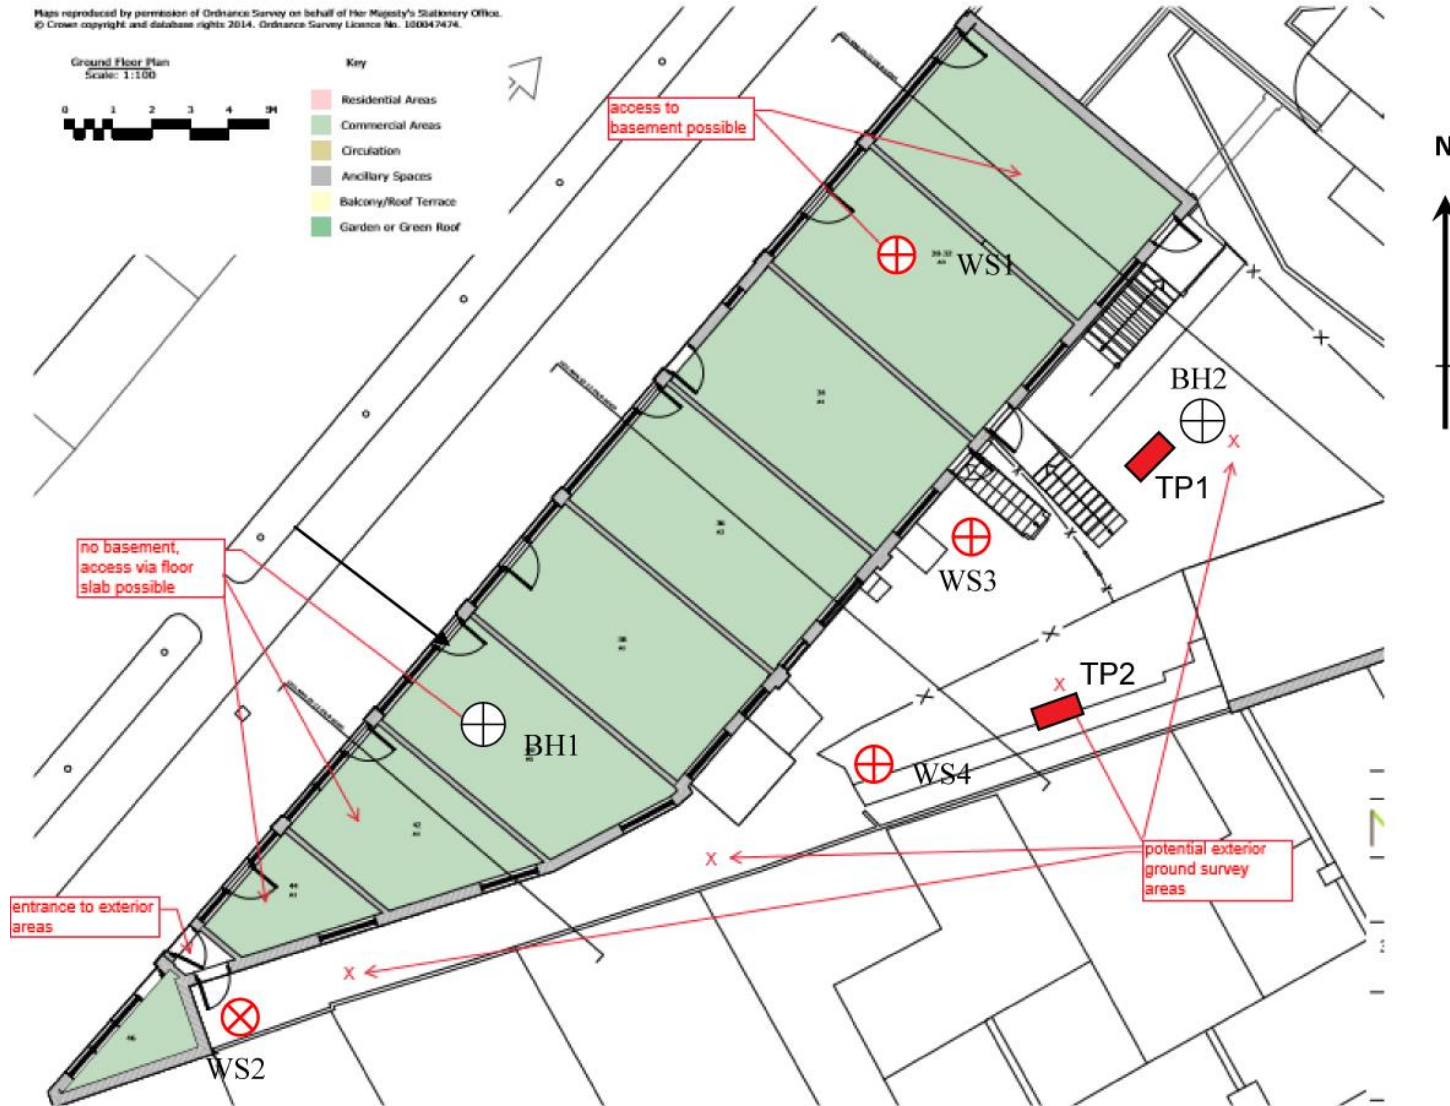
Location of the new test pits at 30-44 Crown Street, Acton. Previous geotechnical interventions also shown. Figure provided by Jomas Associates (2017).
